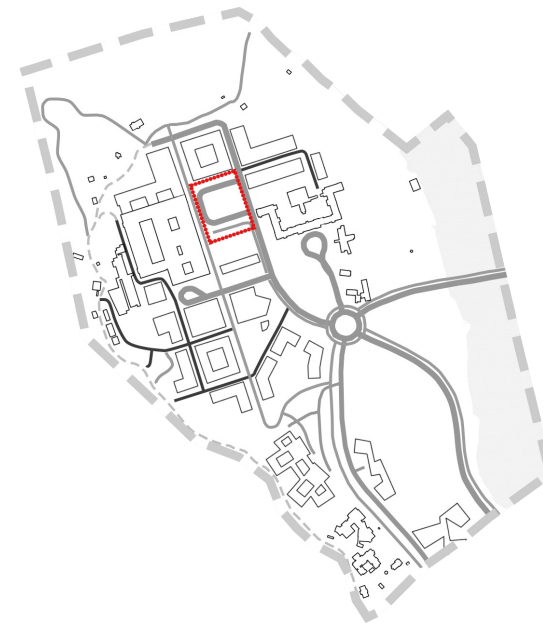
Showing the transformed area, highlighting the new central urban space surrounded by buildings.
